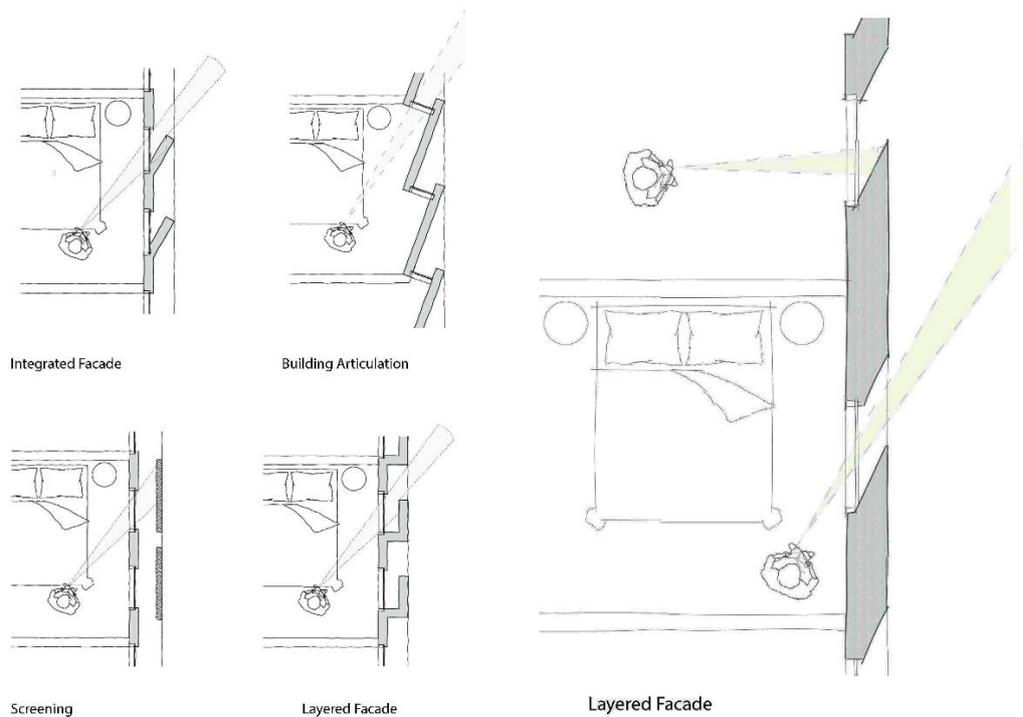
Extracts from the 'Revisions to Stage 1 DA - Design Report' (Crone Architects), illustrating indicative facade design for privacy
